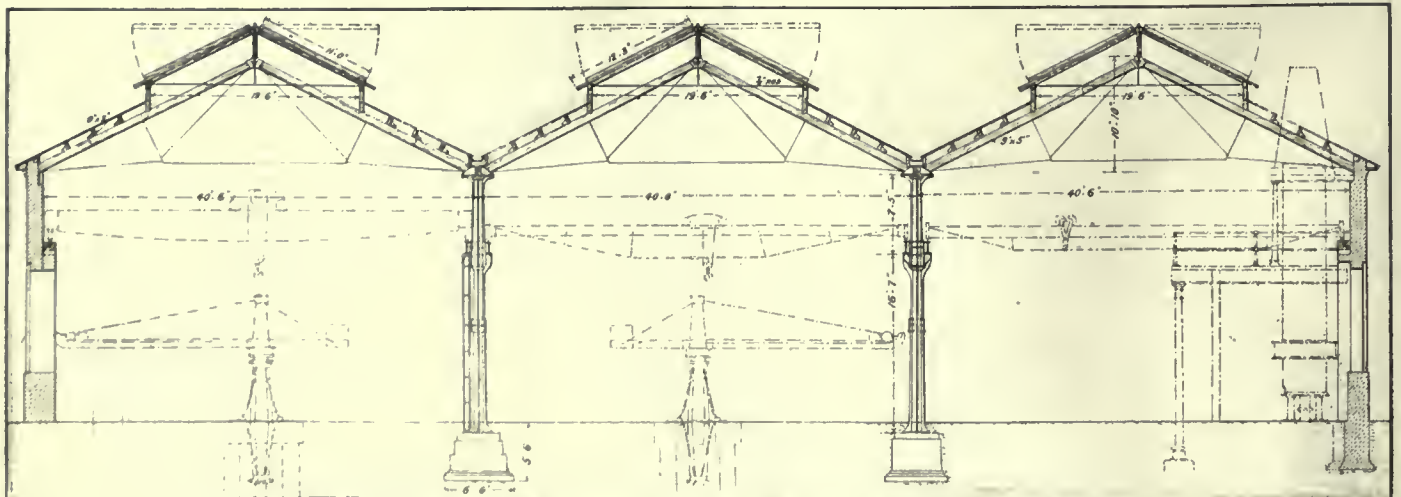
ROOF OF IRON FOUNDRY, LOND ON & NORTH WESTERN RY., CREWELTON
